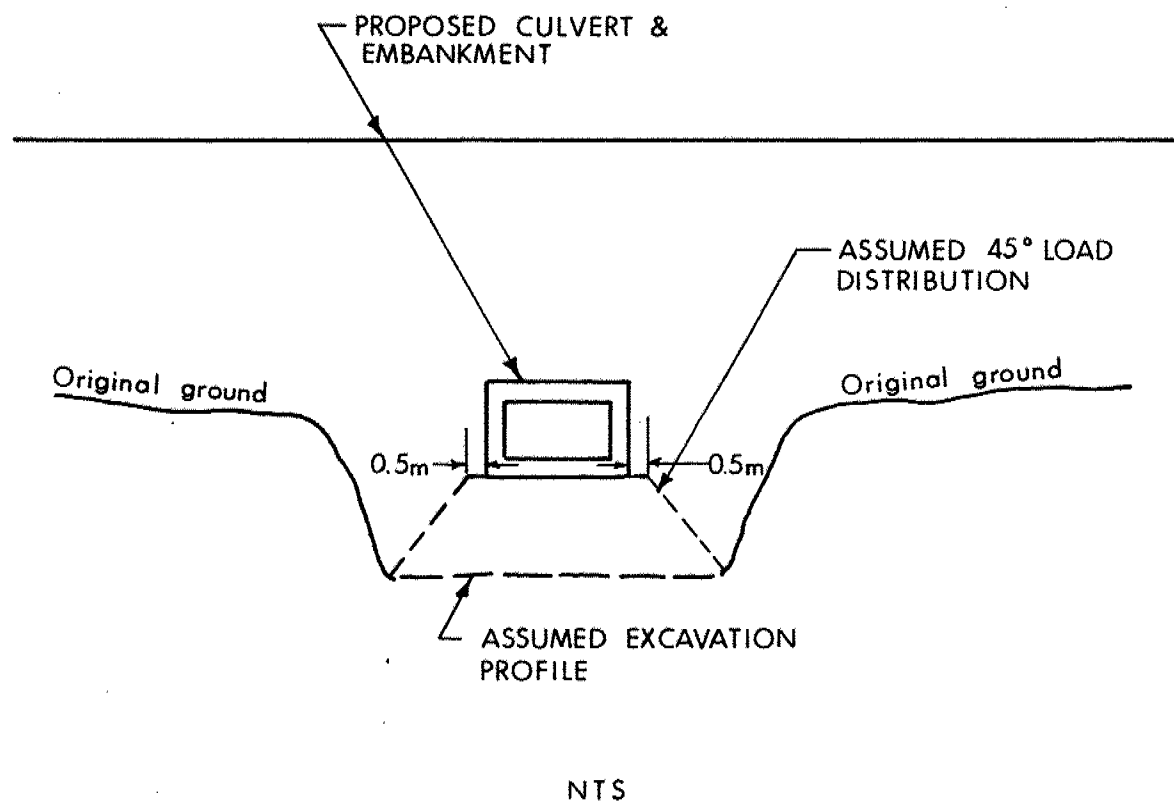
CROSS SECTION SHOWING SUBEXCAVATION PROFILE
